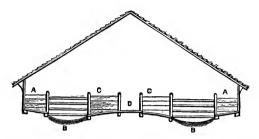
Construction of Pig-Pen—A A, Sleeping Apartments, 5 feet wide, 5 inches fall; B B, Manure Depressions, 8 feet wide, 1 foot deep, with lifting gates; C C, Feeding Floors, 5 feet wide; D, Entry or Centre Alley, 4 feet wide. Partitions are 3 feet high; Entire width, as above represented for double tier of pens, 40 feet.
